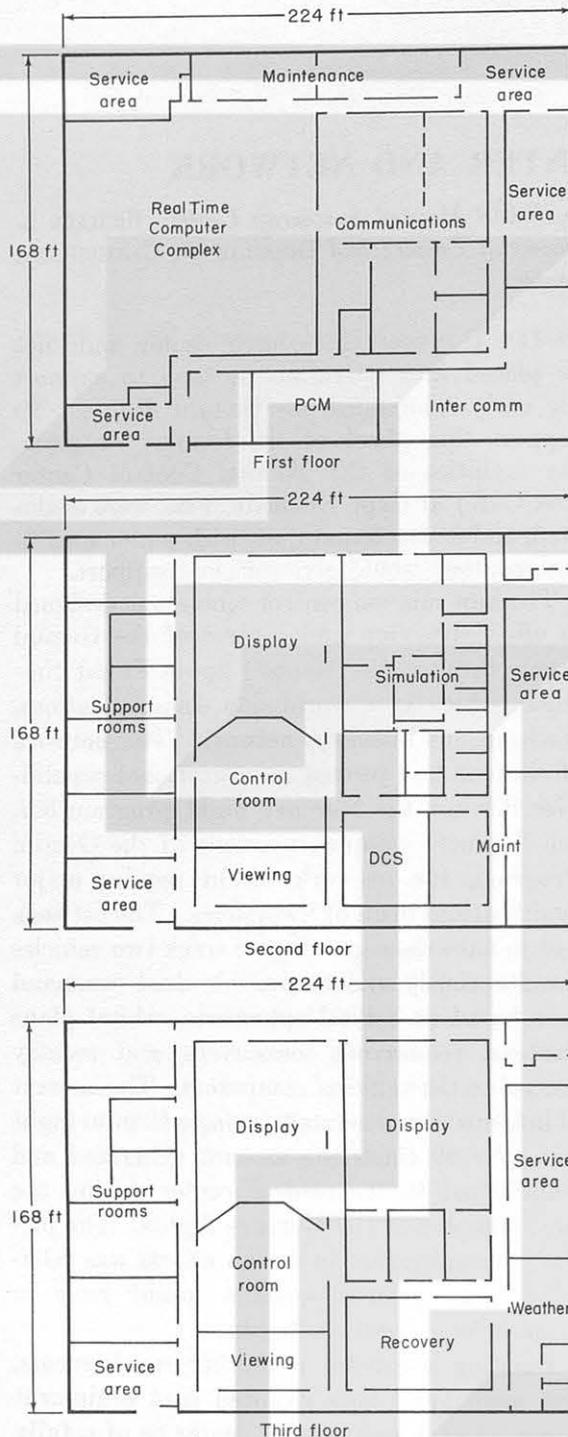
Floor plan of Mission Control Center, Houston, Tex.
